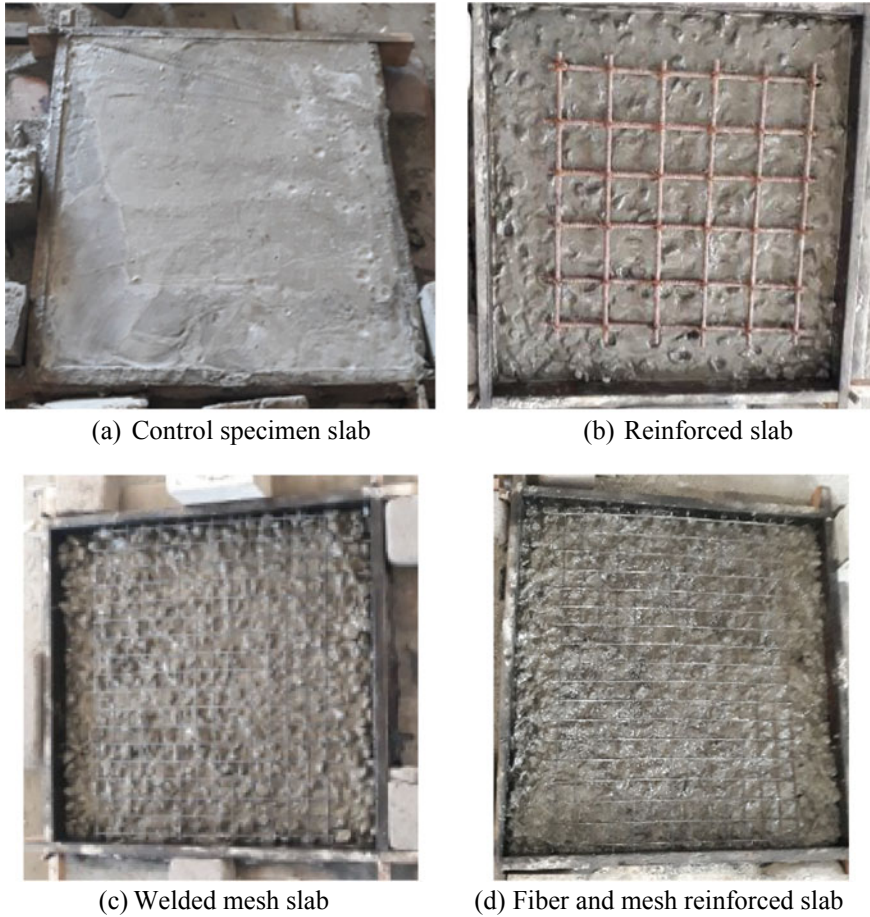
Testing of mesh reinforcement slabs against impact testing
